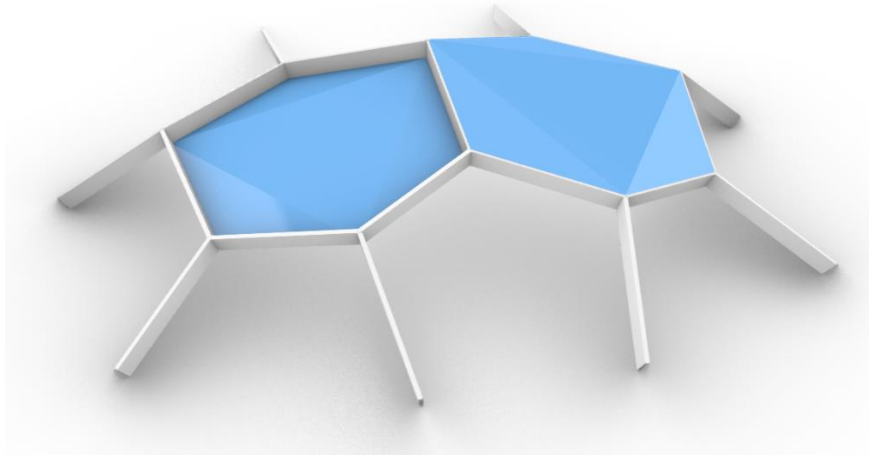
With edge offset, panels can be located on top and bottom of beams of constant section
